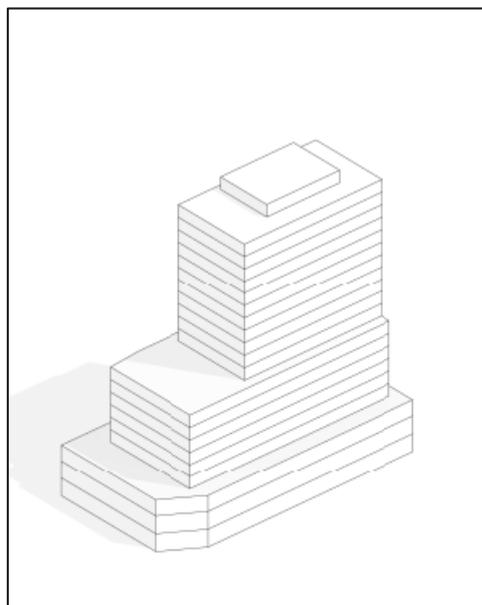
Proposed Envelope looking north each (Source: Team2 Concept Design)
